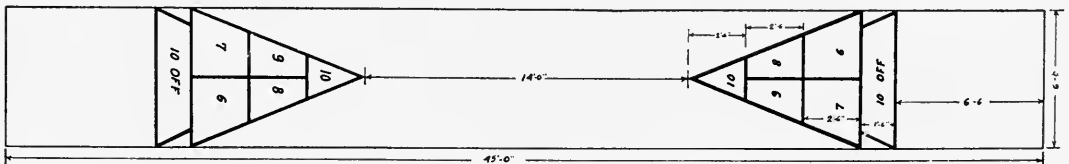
DIAGRAM FOR LAYING OUT A SHUFFLEBOARD COURT
